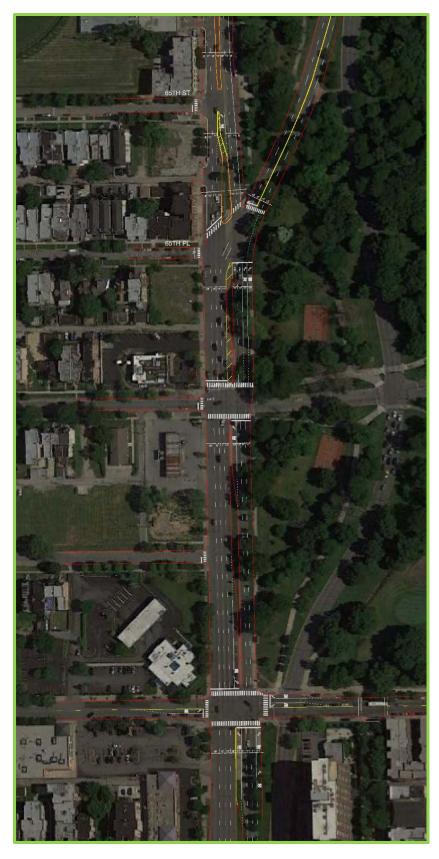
Stony Island Avenue between 68th Street and 65th Place/SB Cornell Mitigation
